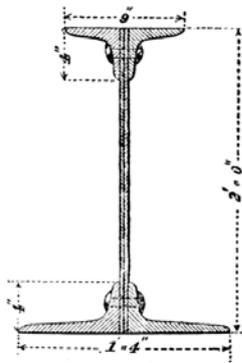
Built-up wrought-iron asymmetrical I-section for deck beam in shipbuilding, William Fairbairn, c.1839. (Dempsey)
